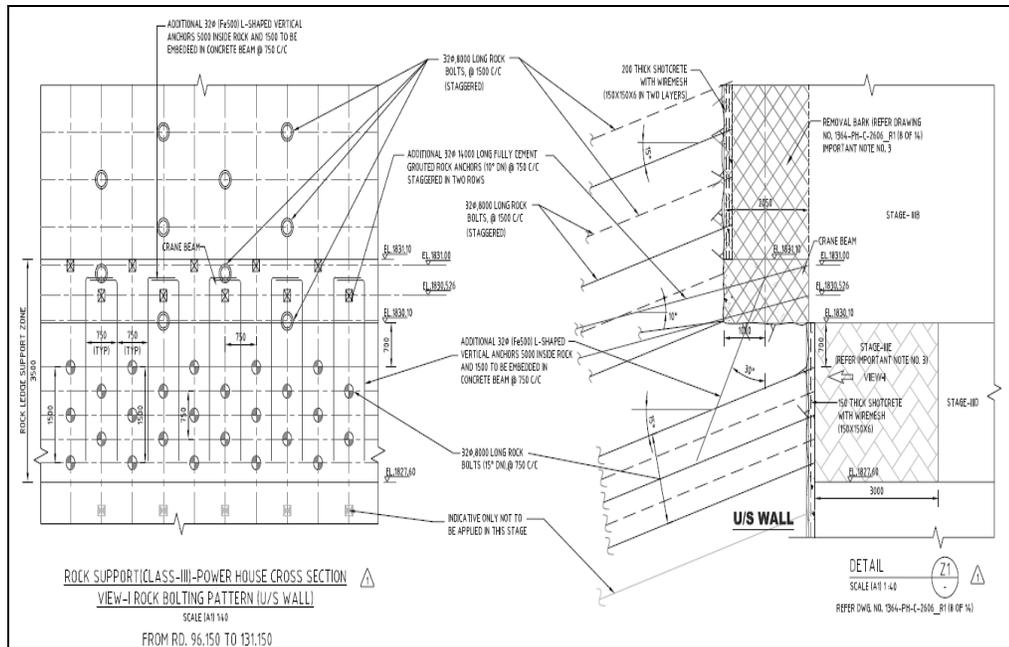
Typical arrangement of proposed rock ledge for supporting crane beam.
